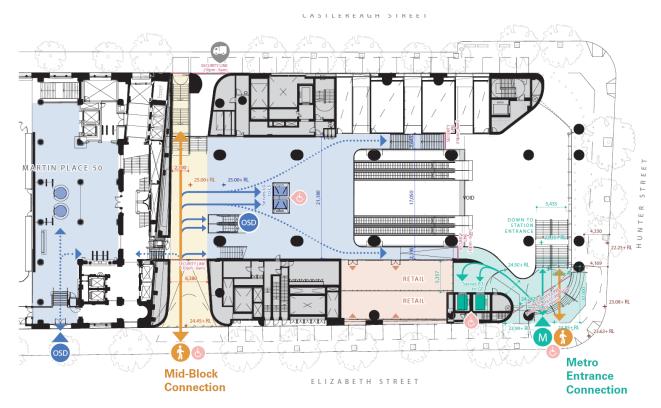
Secure entry locations out-of-hours (Elizabeth Street level)
